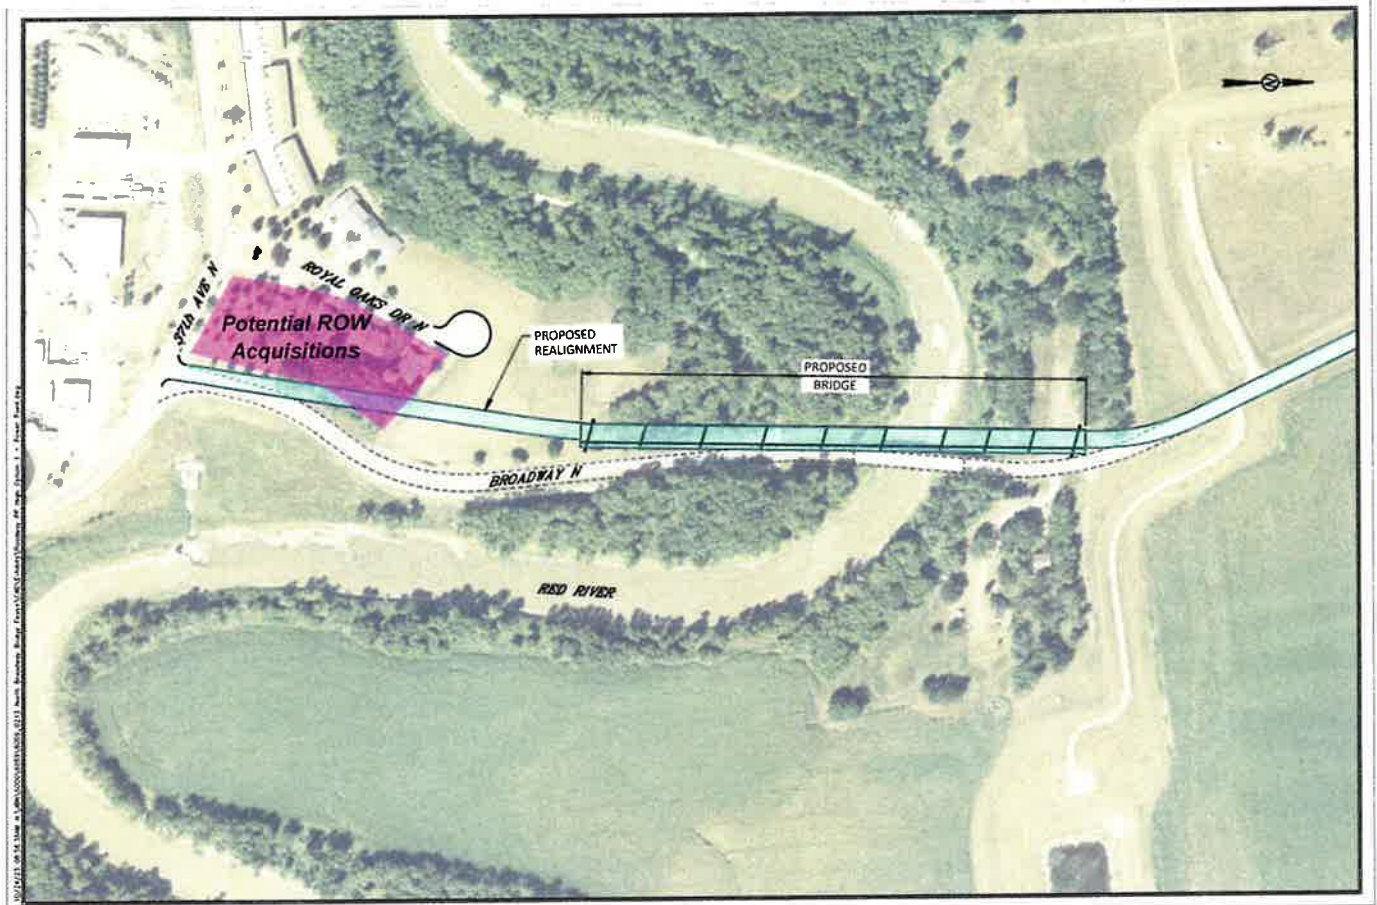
Option 2a Proposed Roadway Realignment and Bridge
